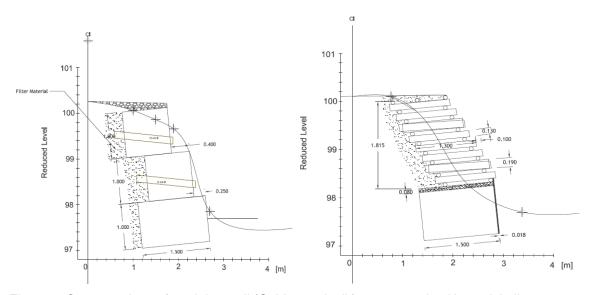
Cross sections of retaining wall (Gabion and crib) constructed at Kusunti, Lalitpur
